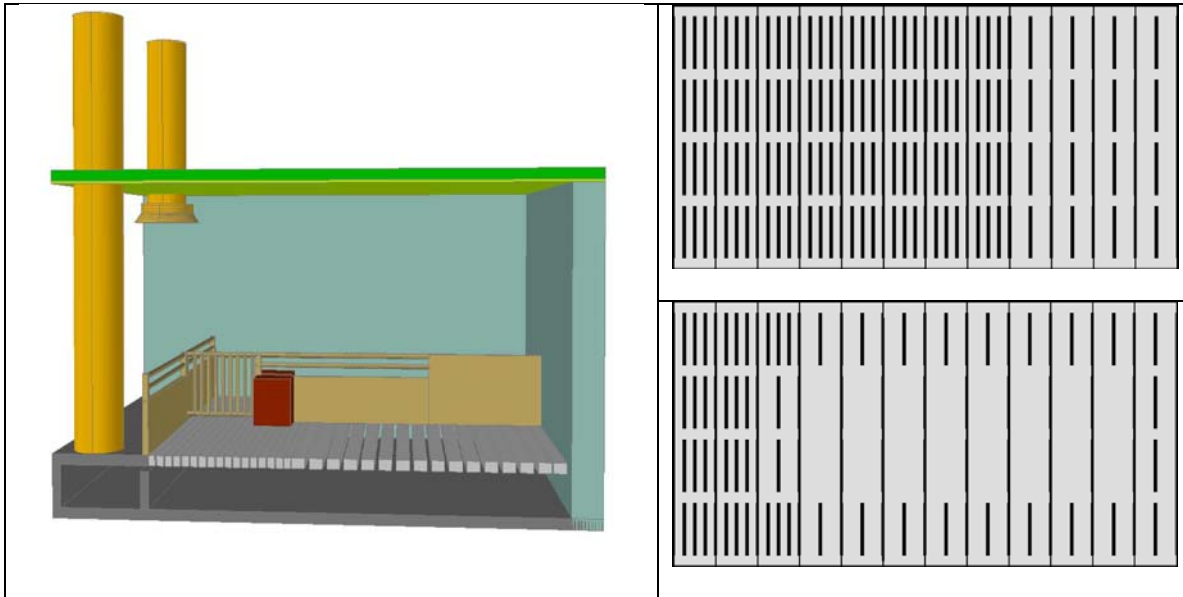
The lay-out of the three climate sections used in this study. The control section was equipped with only ceiling exhaust and fully slatted flooring. In both experimental sections shown in the lower right corner, the openings of the slats in the fully slatted flooring were reduced by 40 per cent in order to improve the efficiency of the pit ventilation. Two suction points were tried out in the experimental sections, either underneath the dunging area of the pen or underneath the resting area of the pen.
